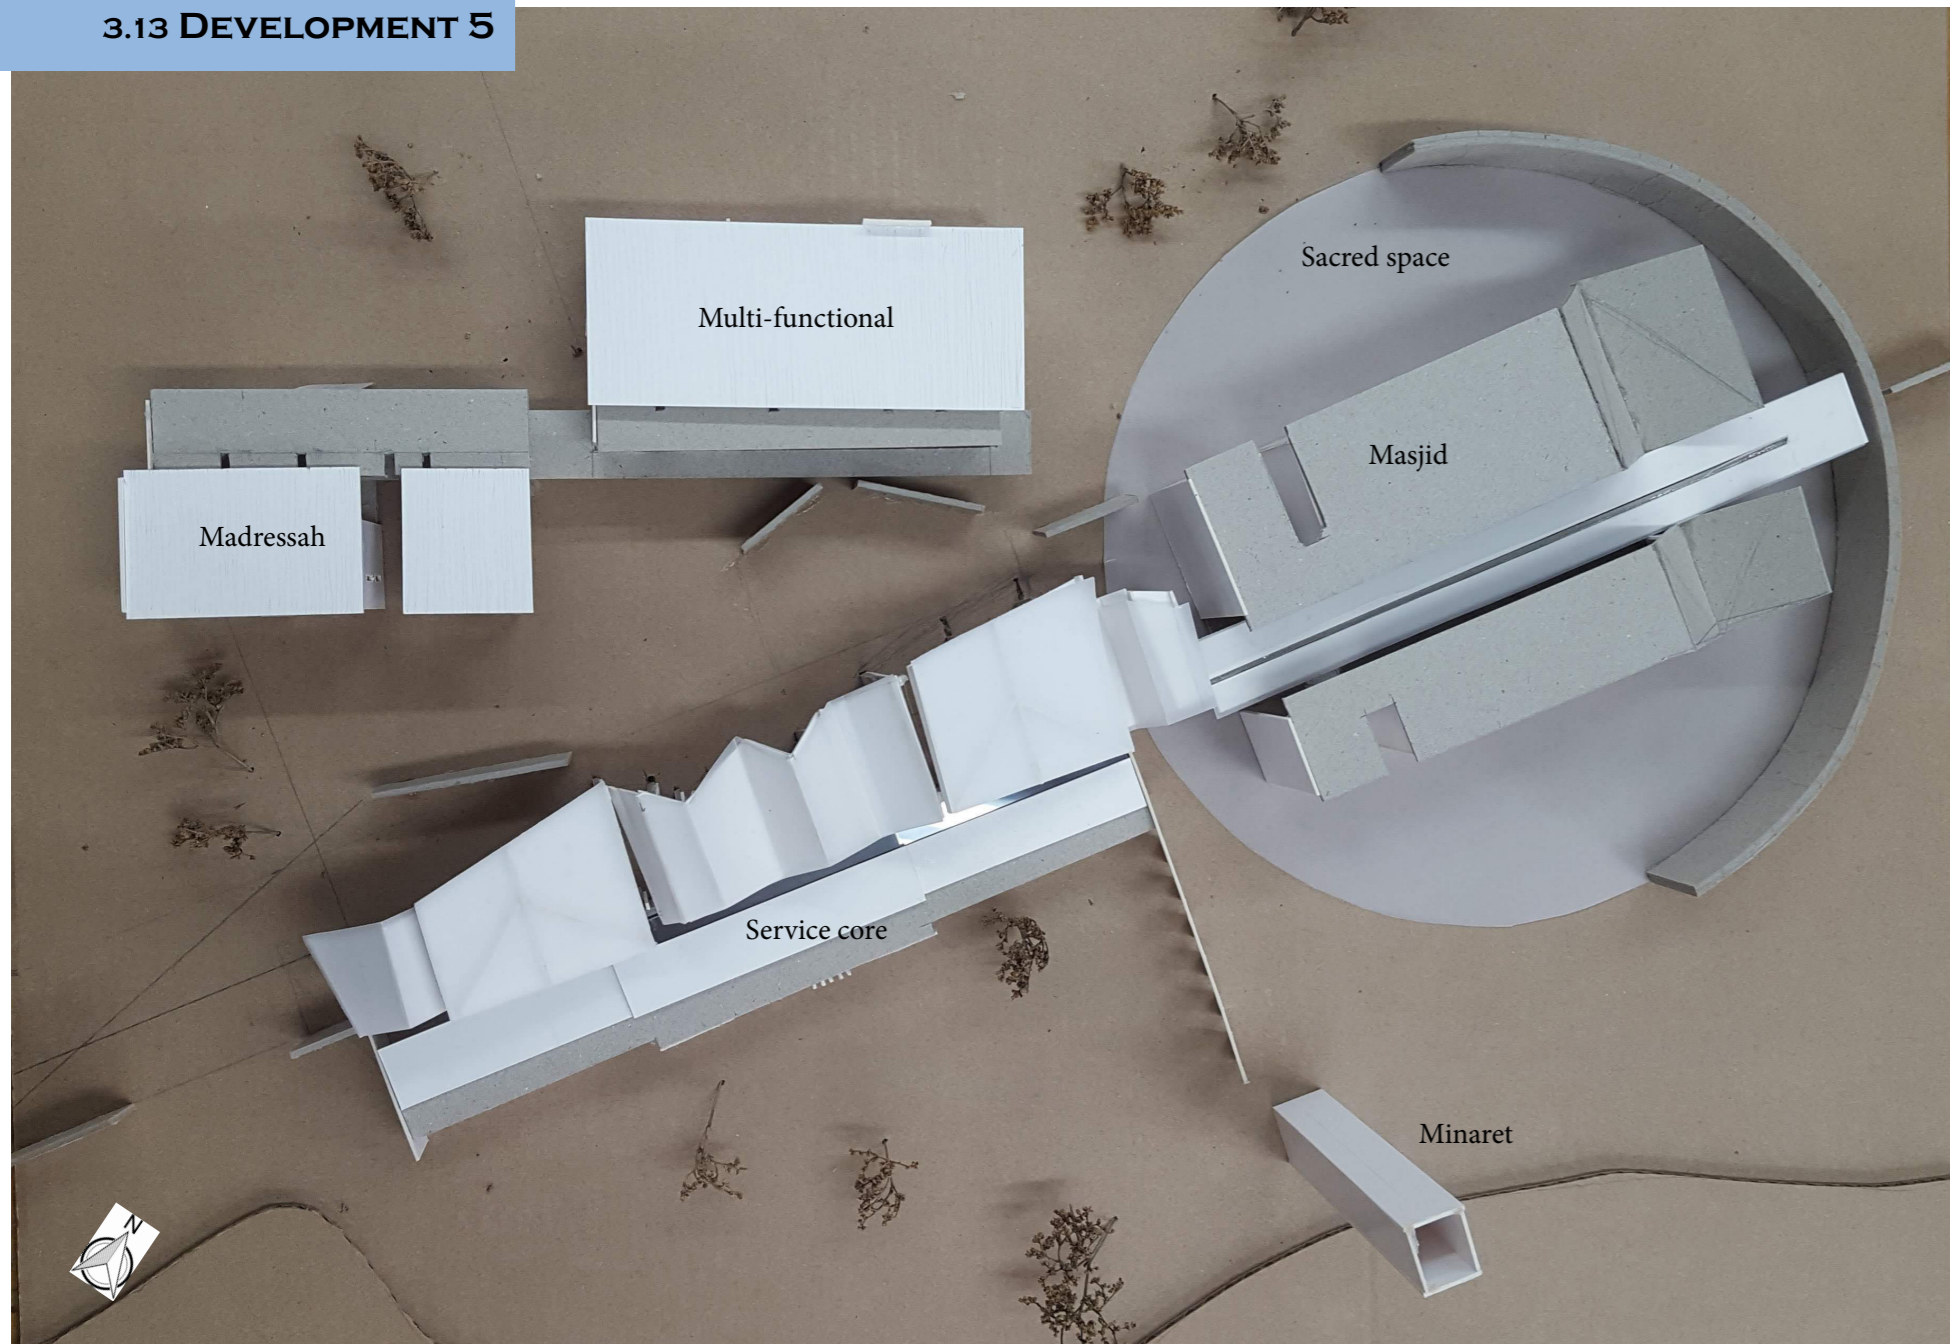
Development 5 model showing a new layout and roof development (Author, 2021).
